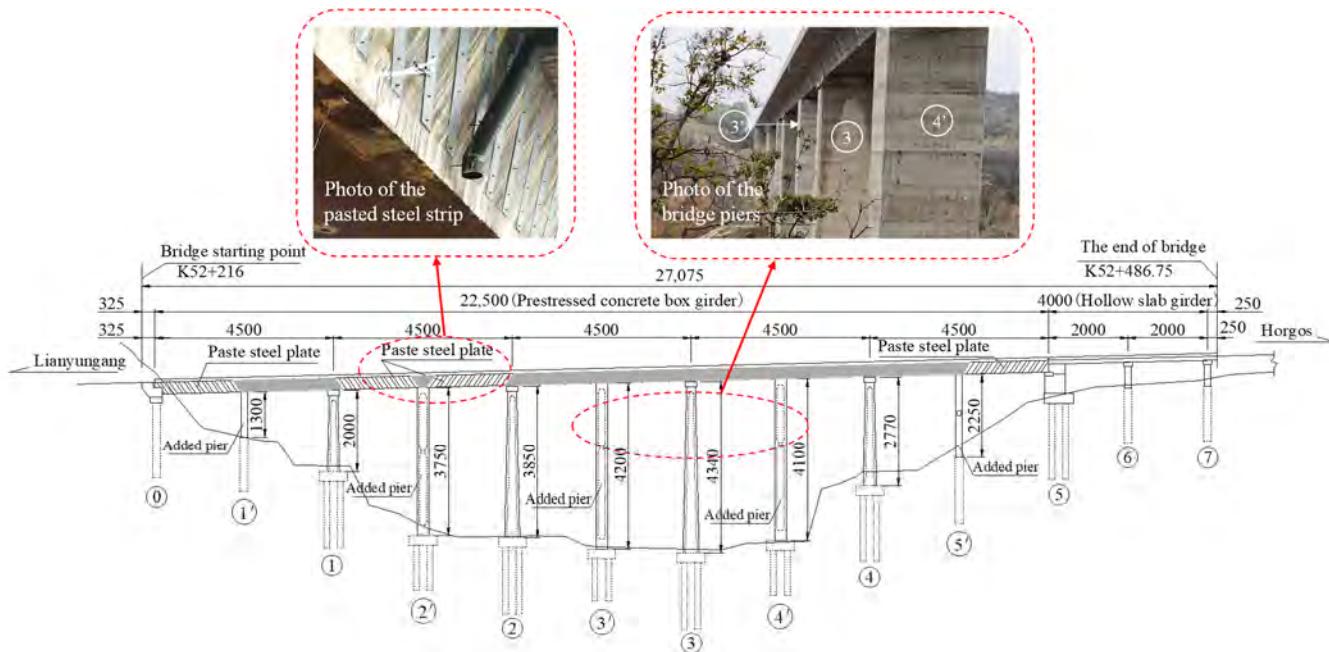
Reinforcement schematic of Scheme 2 (unit: cm).
